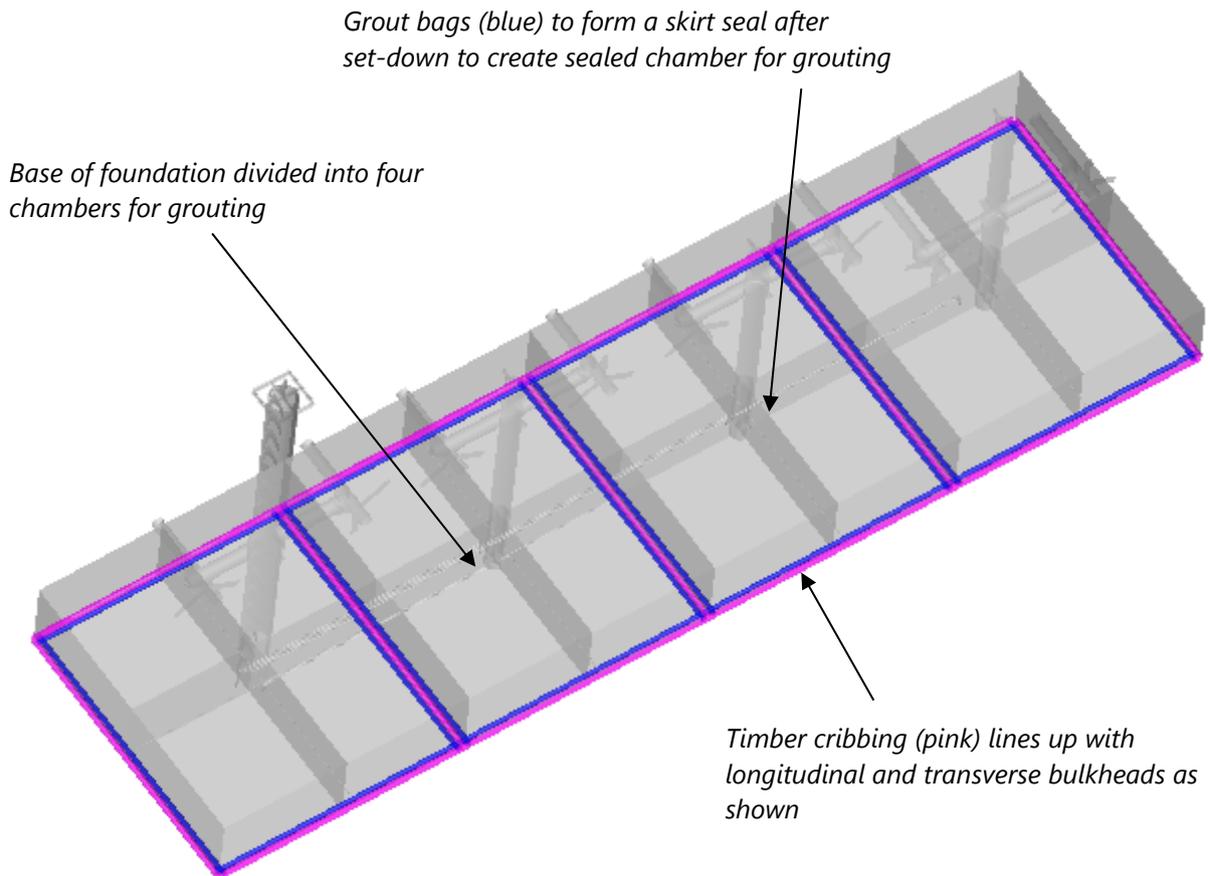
Timber cribbing and grout bags under base of TTR structure
